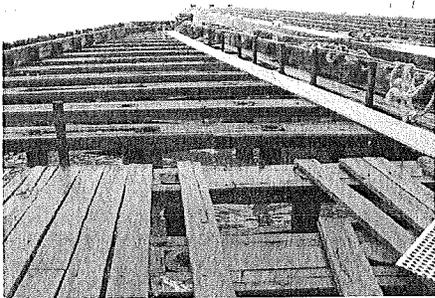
Northern fender system, showing horizontal timbers in overall satisfactory condition and cross bracing in overall poor condition due to section loss and severe worm damage with heavy debris, looking east.
